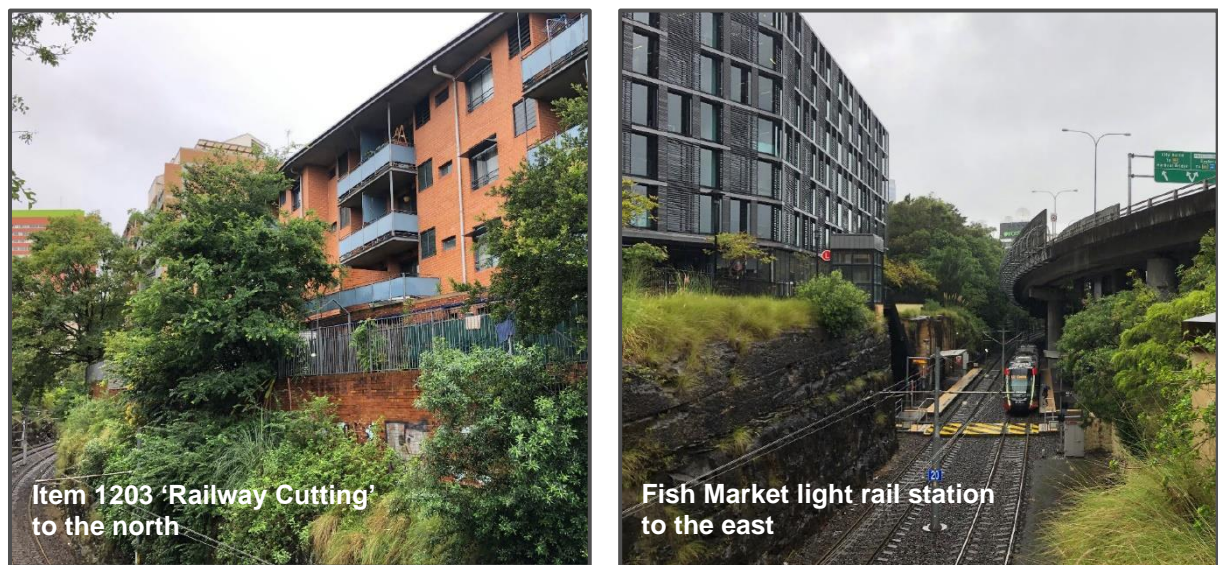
| View of L1 Dulwich Hill Line railway tracks north and east of site (Source: Applicant's documentation)
